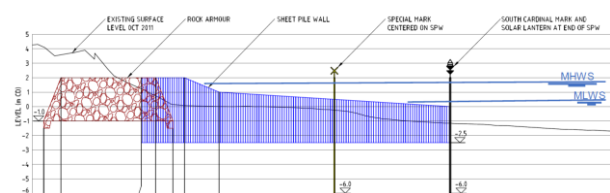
Typical groyne section comprising rock root and plastic sheet pile wall extension submerged on high tide
